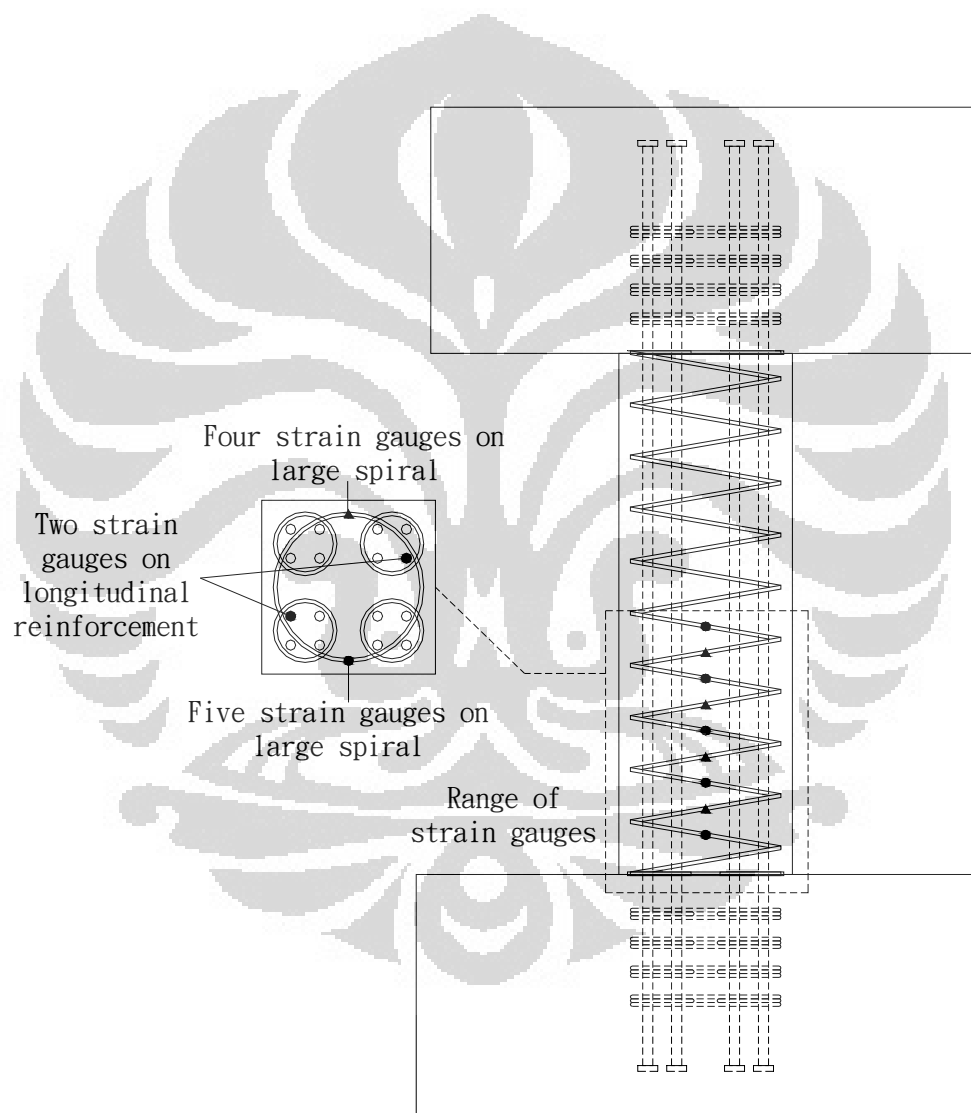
Arrangement and numbering of strain gauges on the transverse and longitudinal bars for type S2 specimen with 180 mm of transverse reinforcement spacing
